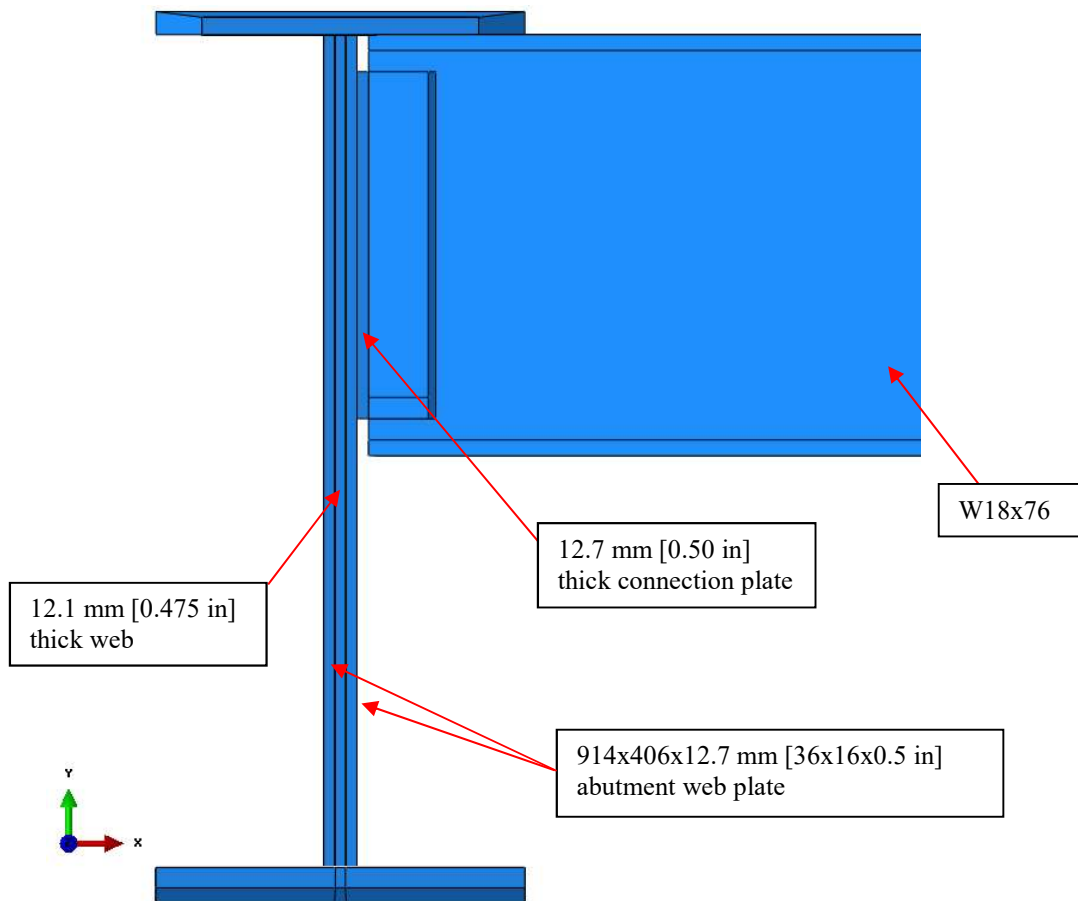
Elevation view of exterior girder at the abutment showing girder and diaphragm connection plates
